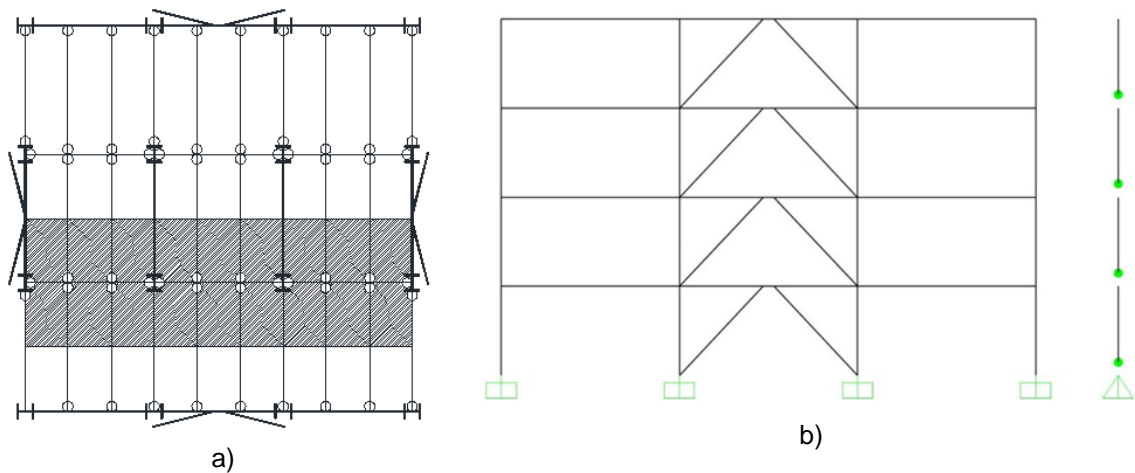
Leaning column approach: a) gravitational loads on interior frame and b) leaning column modelling.
